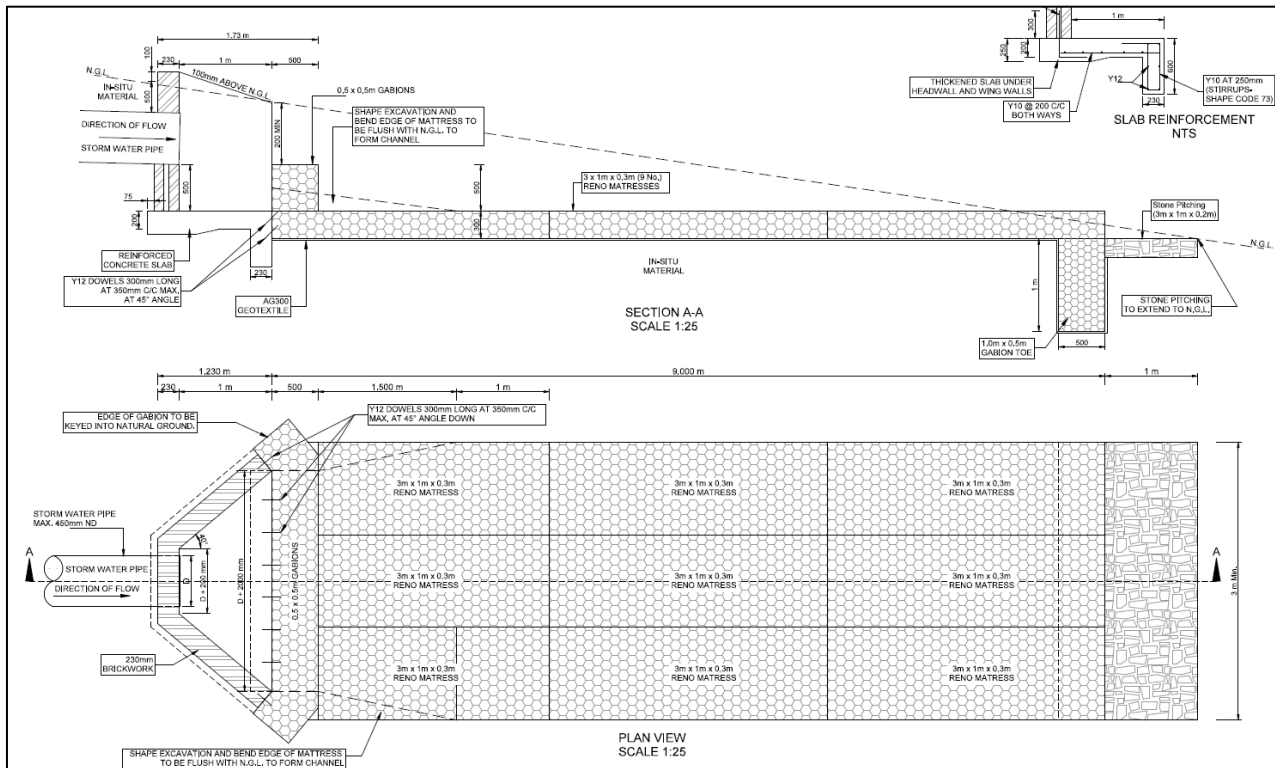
Plan and section view of proposed upgrades to existing stormwater outlets.
